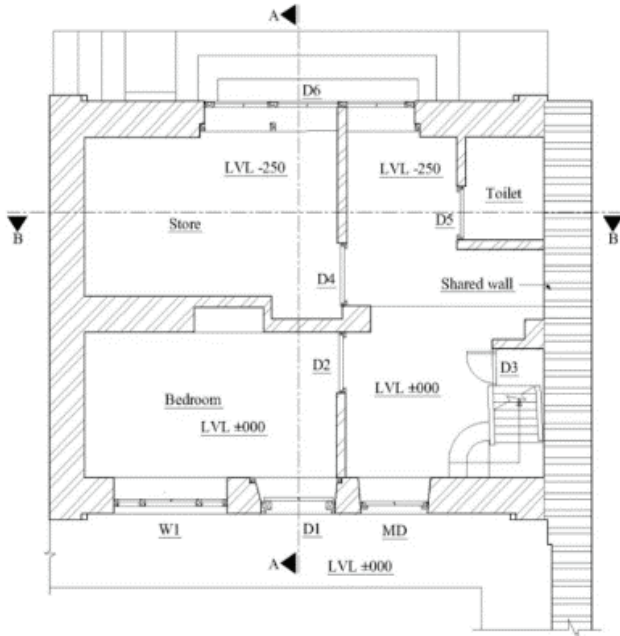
Fig XIV: Ground Floor Plan (Amit Pokhrel, 2012)
